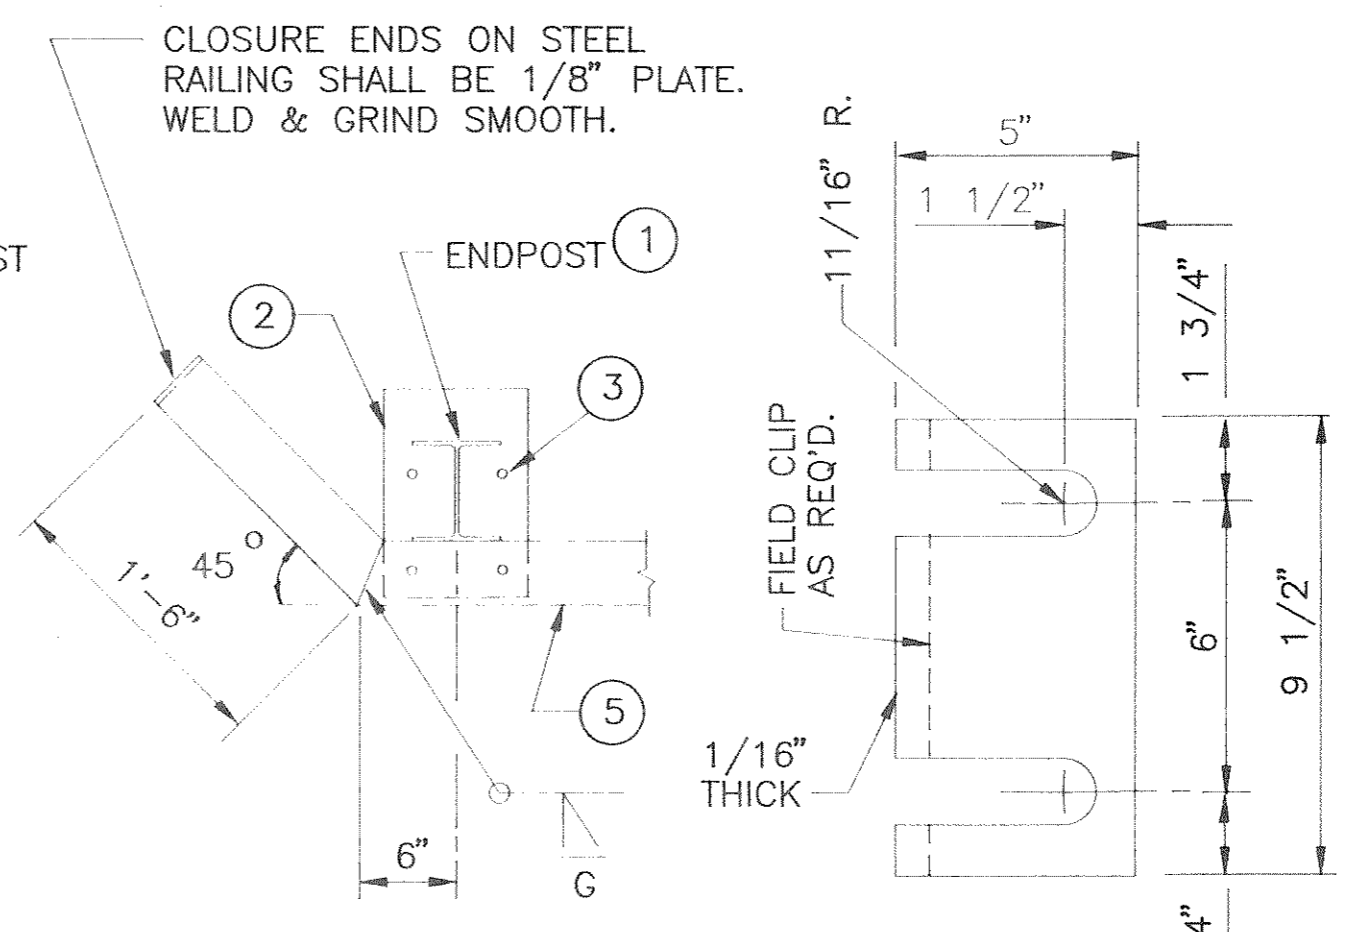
DETAIL AT END POST (PLATE BEAM GUARD RAIL ATTACHMENT)
